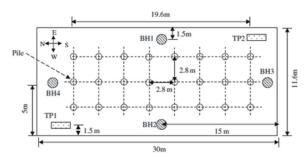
Plan View Showing Piles, Borings and Test Pits (Ornek et al. [12])
